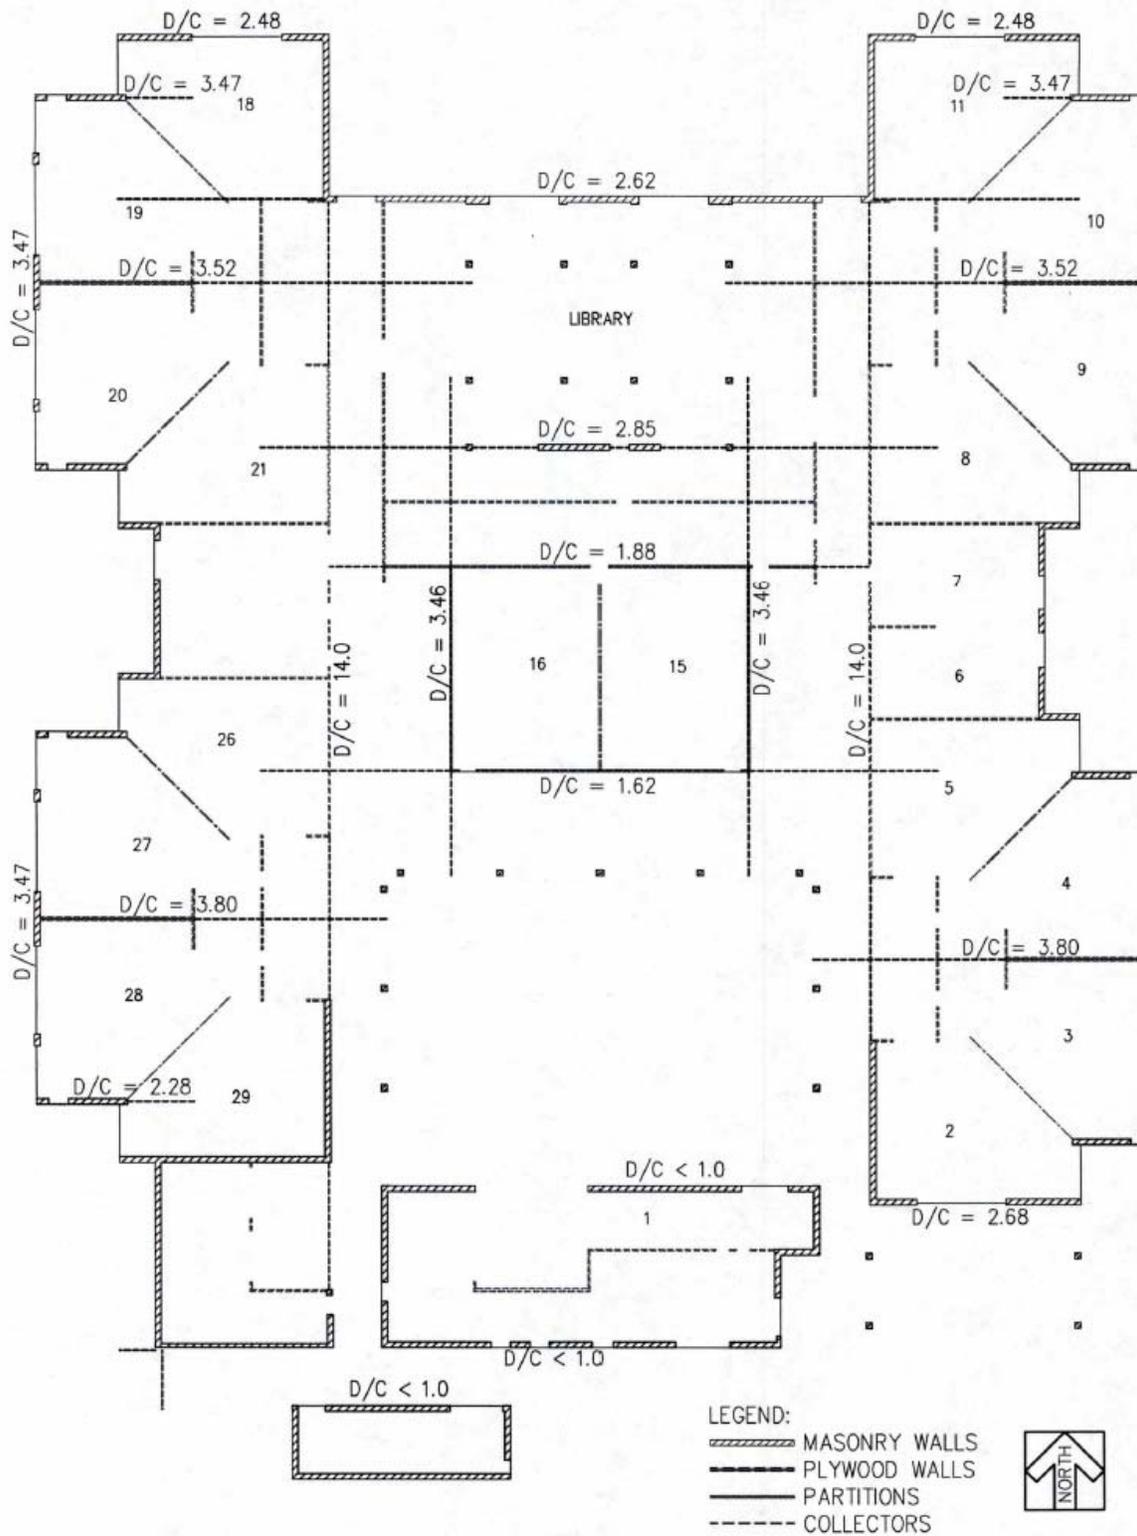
Building A demand-to-capacity ratios (D/C) for the connection of the roof to the shear walls.
